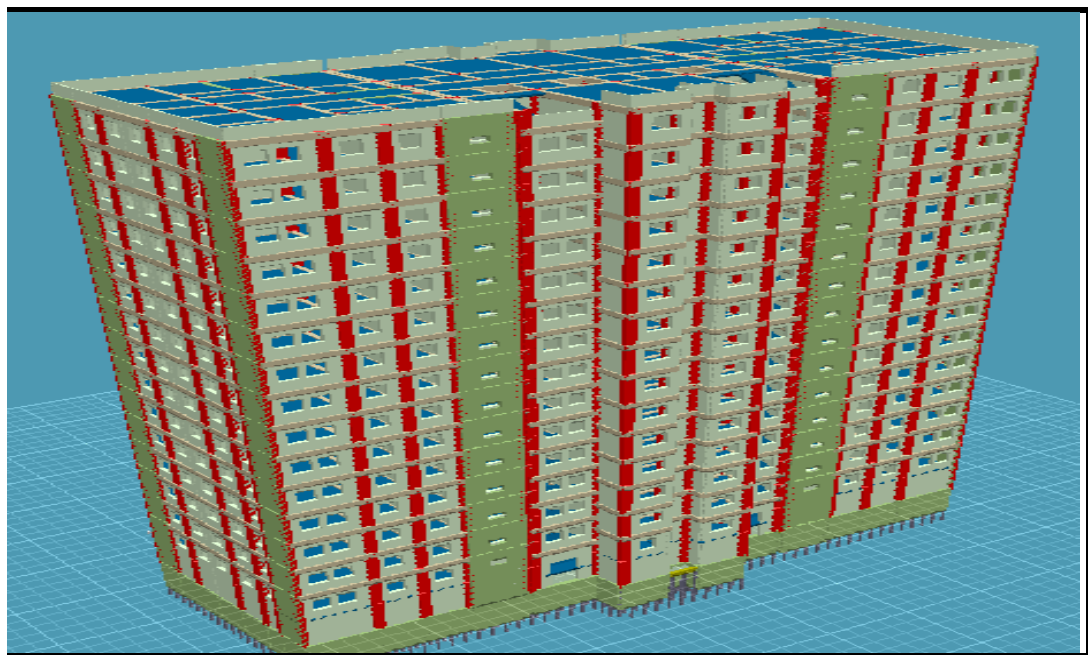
The 3D View of a Building with Fifteen Stories and Stiffened Coupled Shear Wall System
